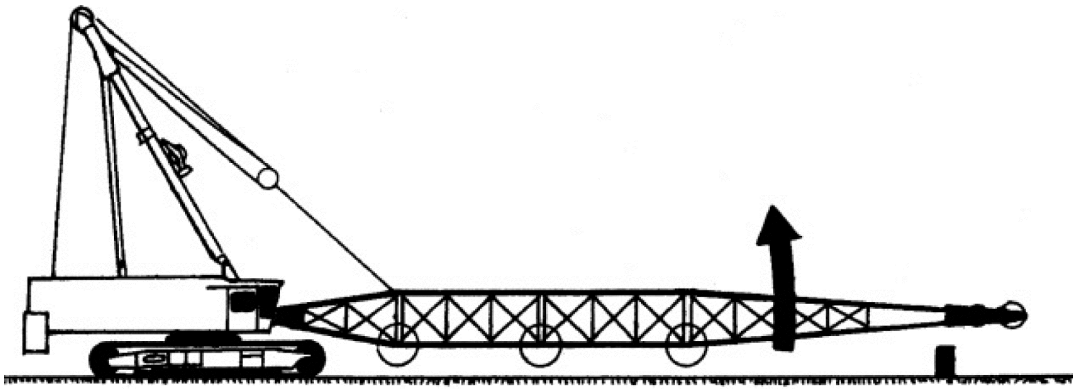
Cantilevered portion of boom is not supported, and top pins therefore are not to be removed. Bottom pins (circled) may be removed.
